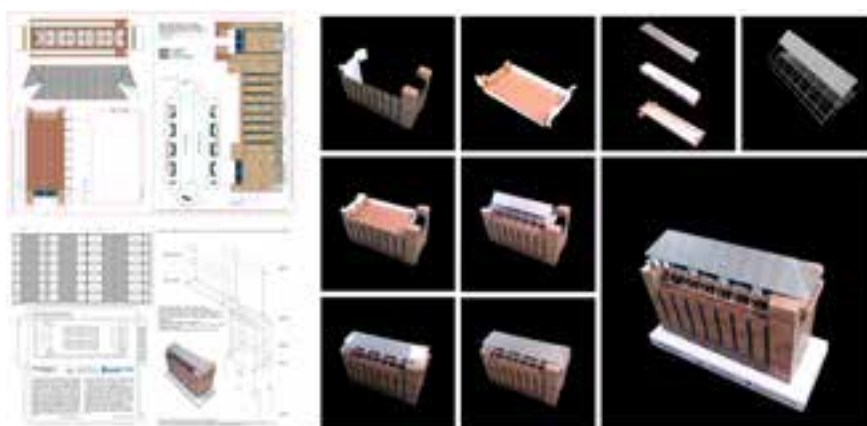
Photographic series: Cutout sheets and pictures of the assembly process (© Fernando Jiménez Parras)
